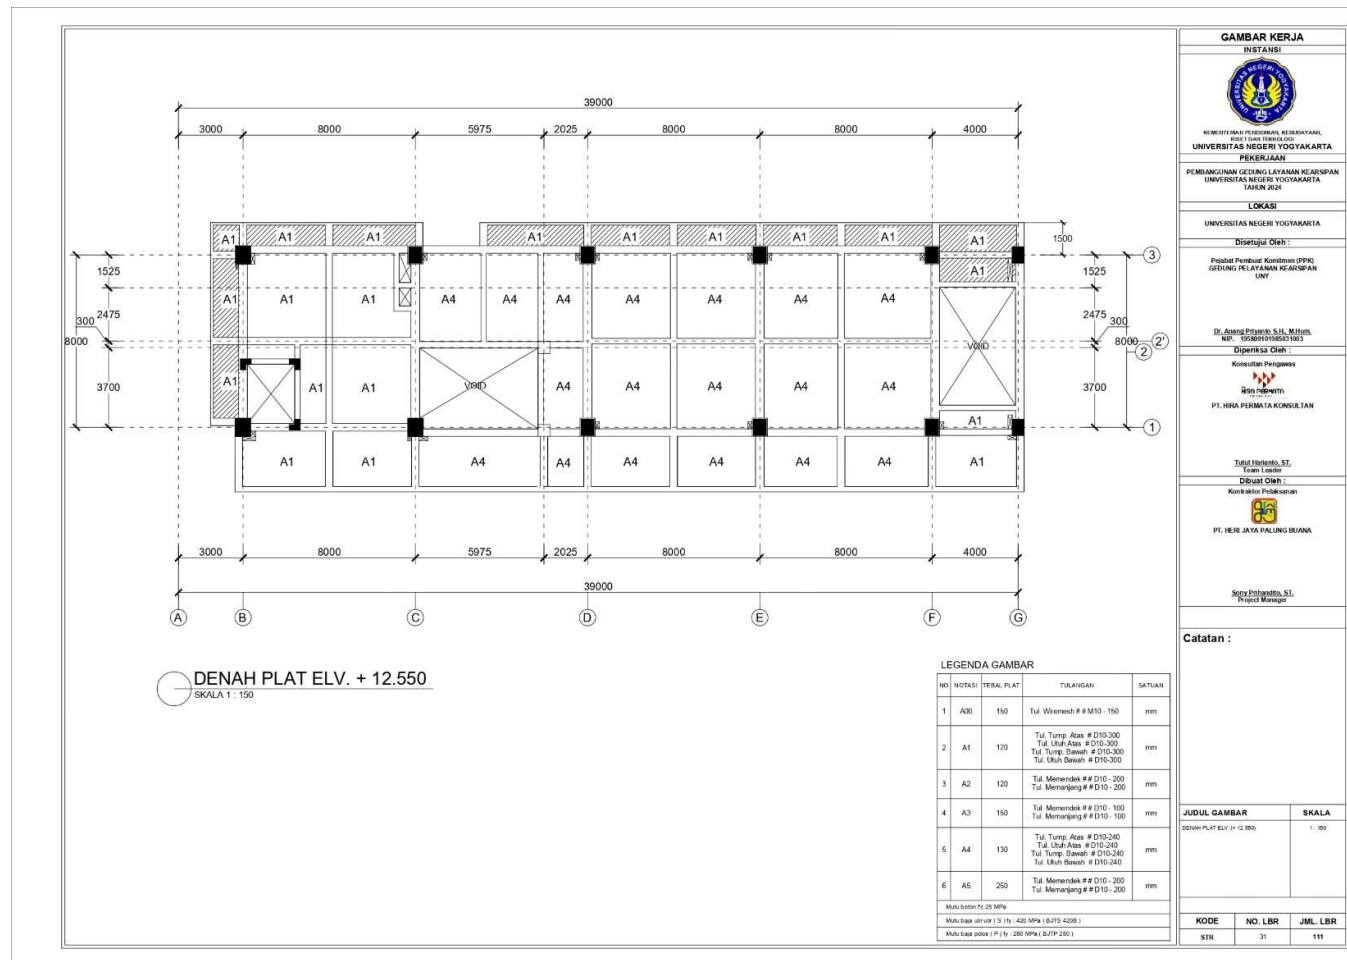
13 Slab Site Plan of Elv. +12.550
